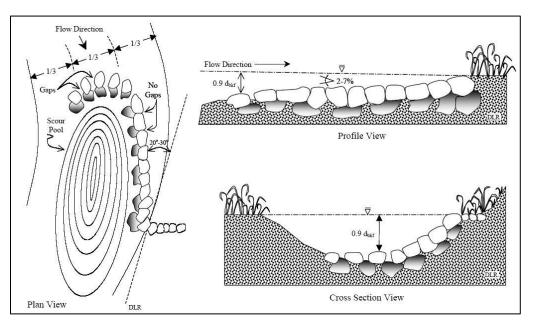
Schematic j-hook vane cross section, profile, and plan view (from Rosgen, 2001b).
